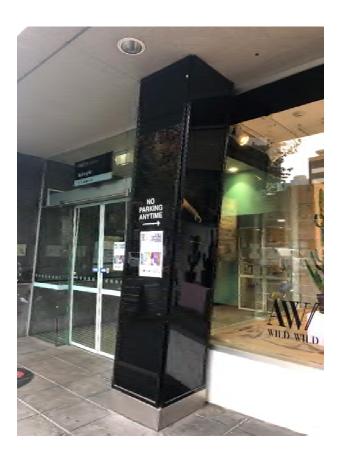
Detail of tilted column, recessed ground floor to northern bay Source: Lovell Chen
